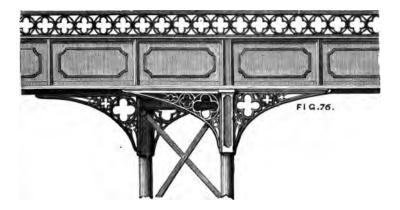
shows a general view of the bridge, and Fig. 76 a portion of one of the piers, with main girders, hand-railing, and cantilever brackets.
